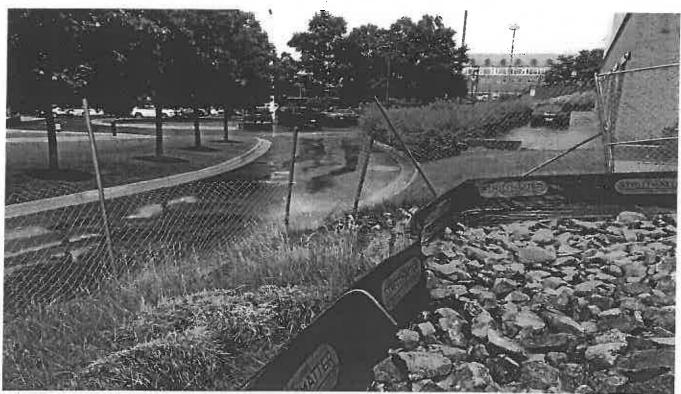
Accumulated silt and sediment at the E and S control footings at the Slope of the Tunnel Project
